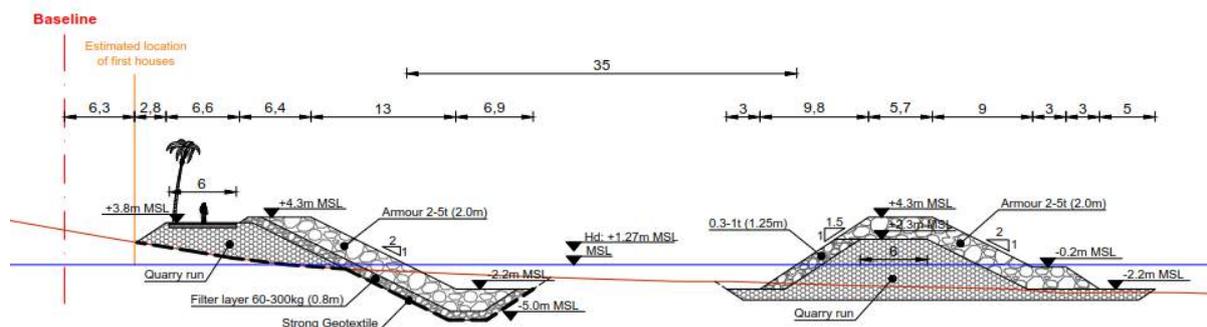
Principle cross-section fishing landing site middle part West Point revetment (Alternative A)
